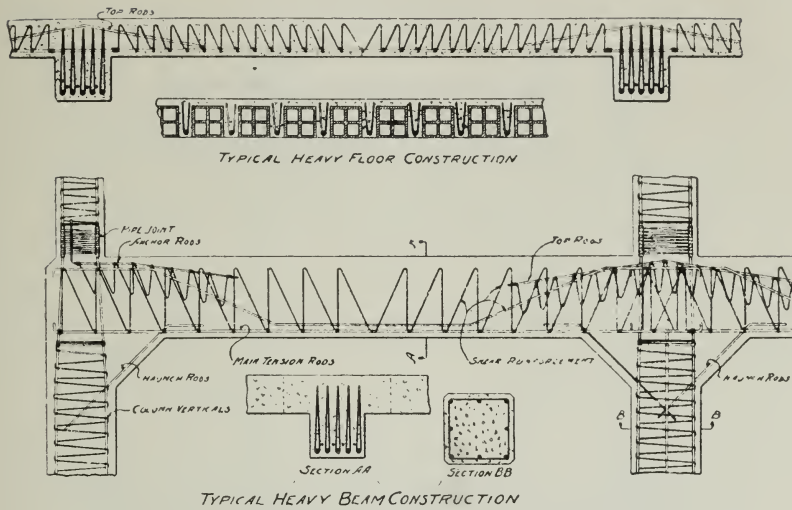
Gabriel System of Reinforced Concrete Construction.
